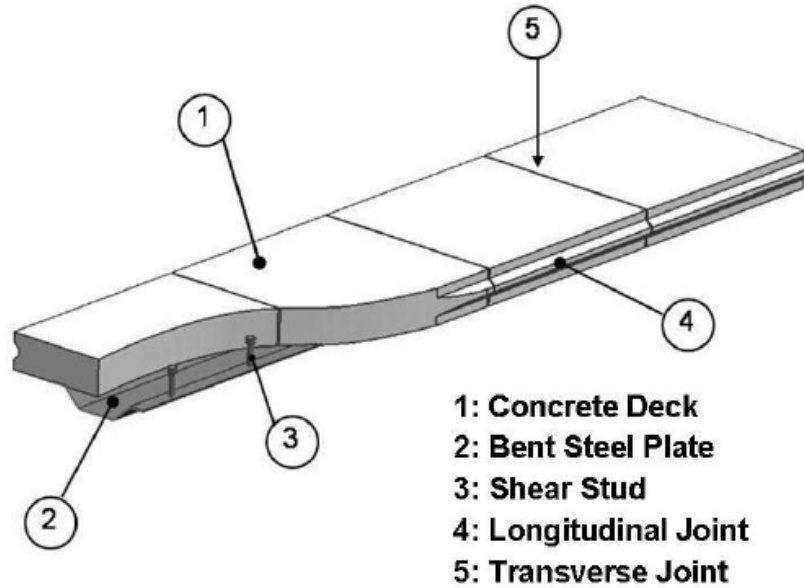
MDOT Proposed Bridge System (Burgueno & Pavlich, 2008)
